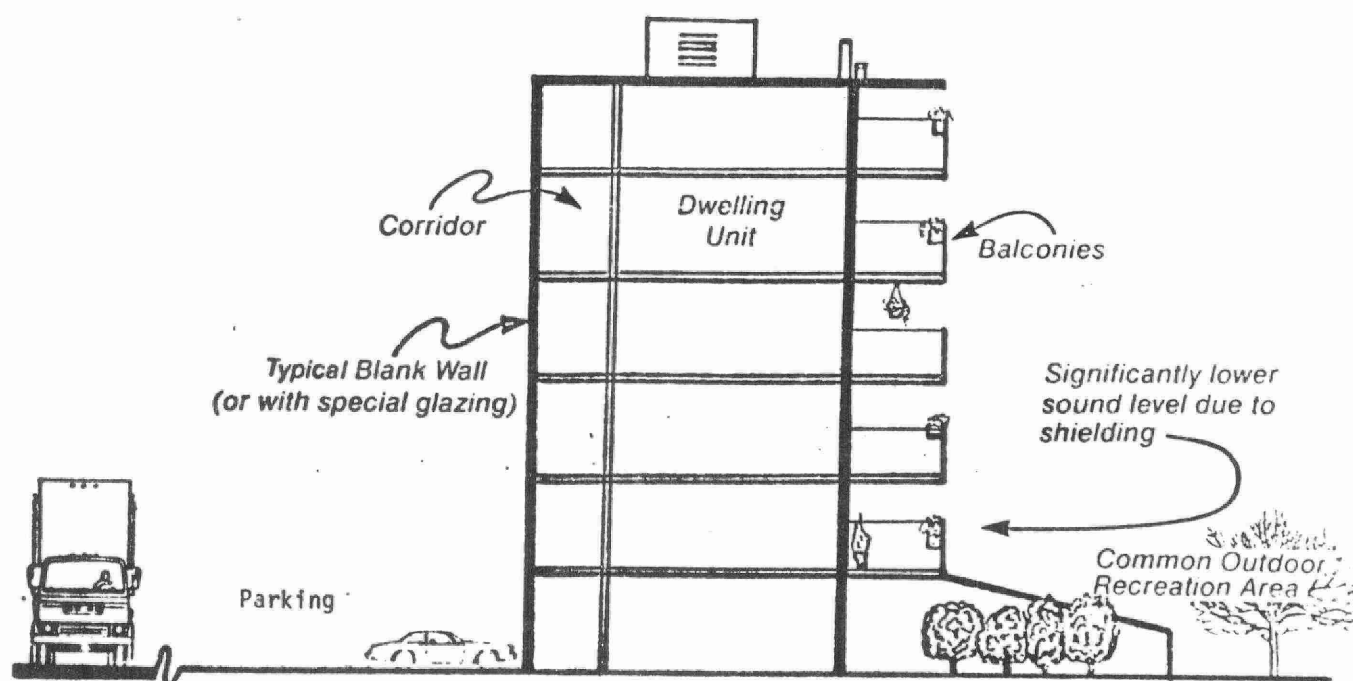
The use of blank walls for an apartment building or stacked townhouses
